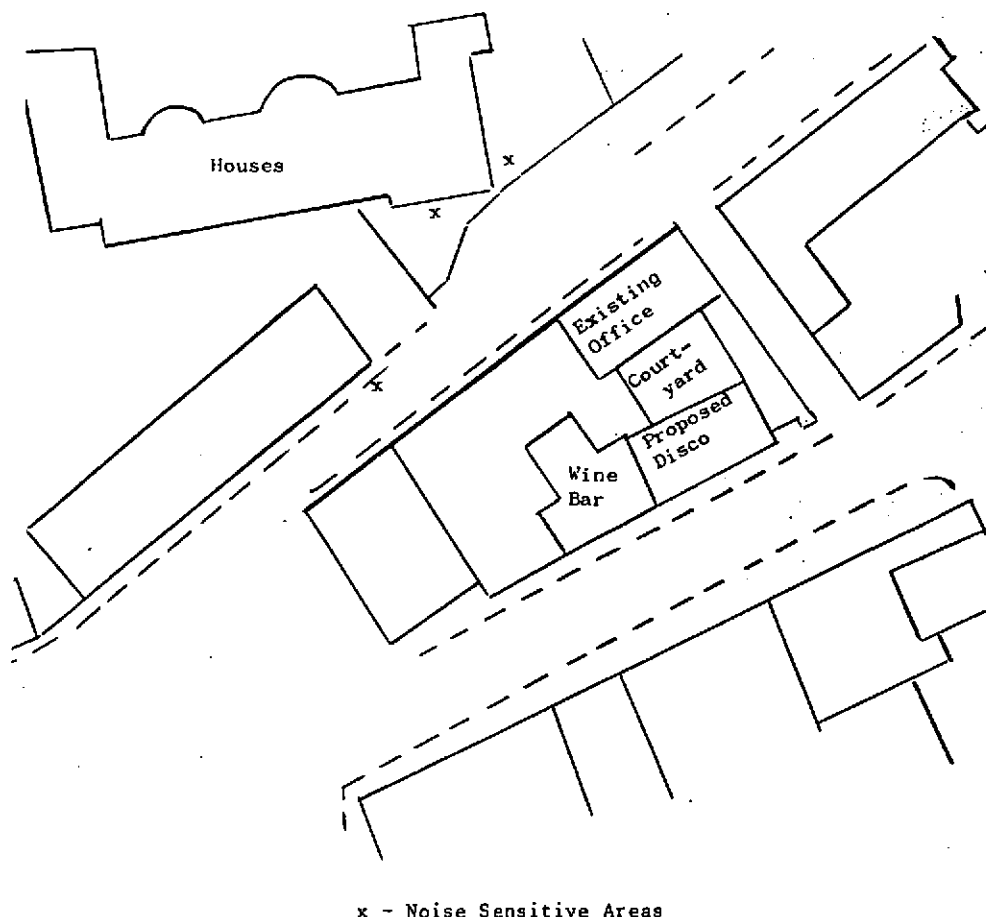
Area Plan; showing first floor proposed disco, ground floor wine bar and other buildings.
